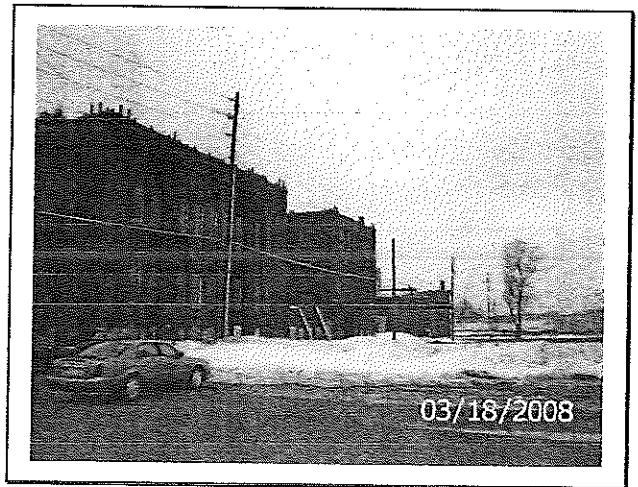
Viewing exterior of Rath Administration Building, looking Southwest.
